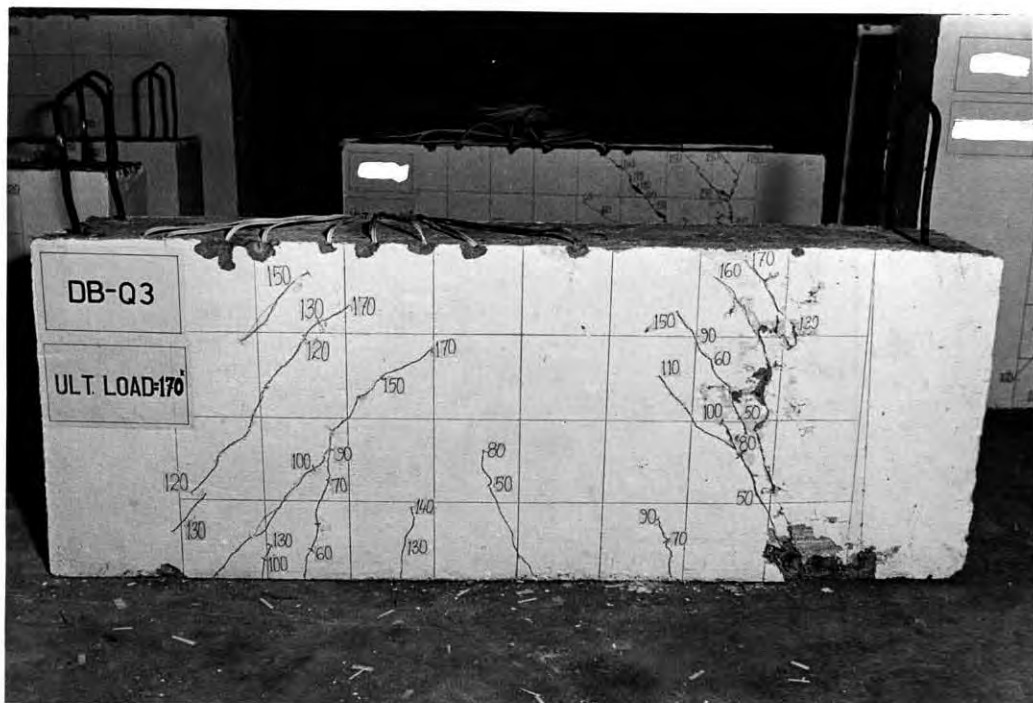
Mode of Failure and Crack Pattern of Beam DB-Q3
